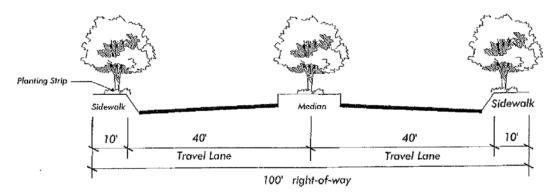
CITY OF BALDWIN PARK GENERAL PLAN CIRCULATION ELEMENT
